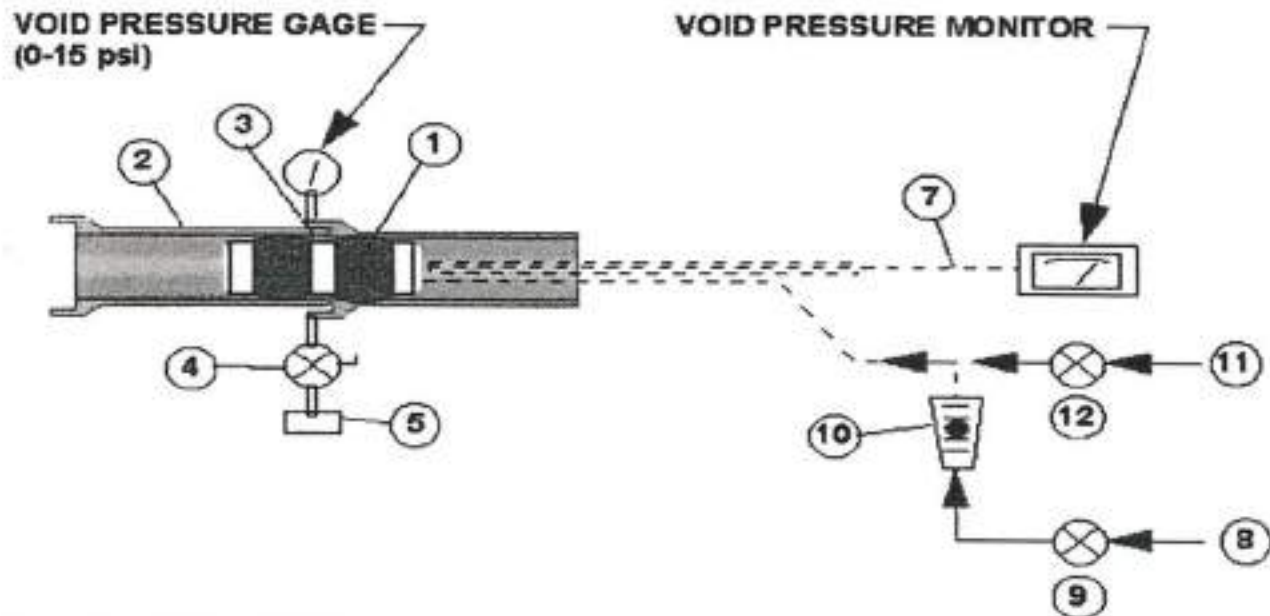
PIPE JOINT TESTING EQUIPMENT & CONTROL TEST SETUP
